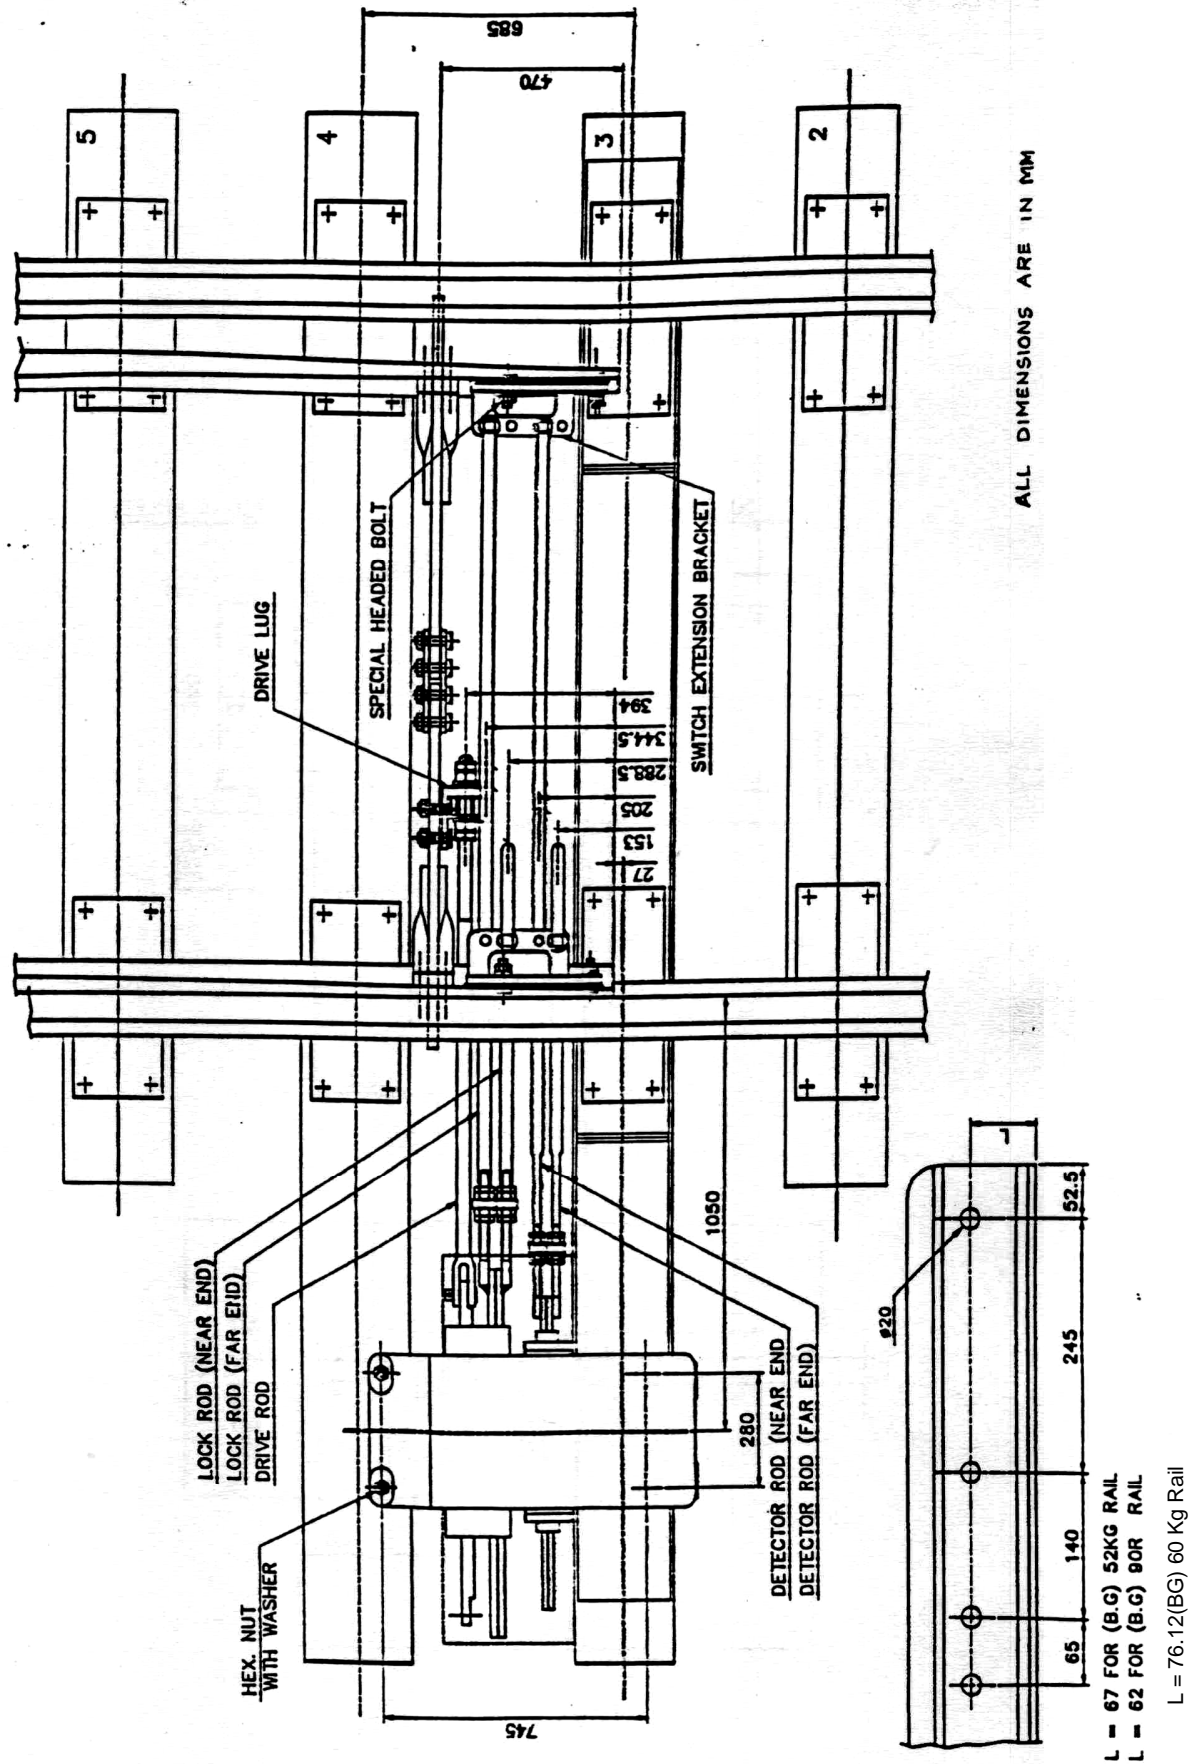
THE LAYOUT ARRANGEMENT OF IRS POINT MACHINE
